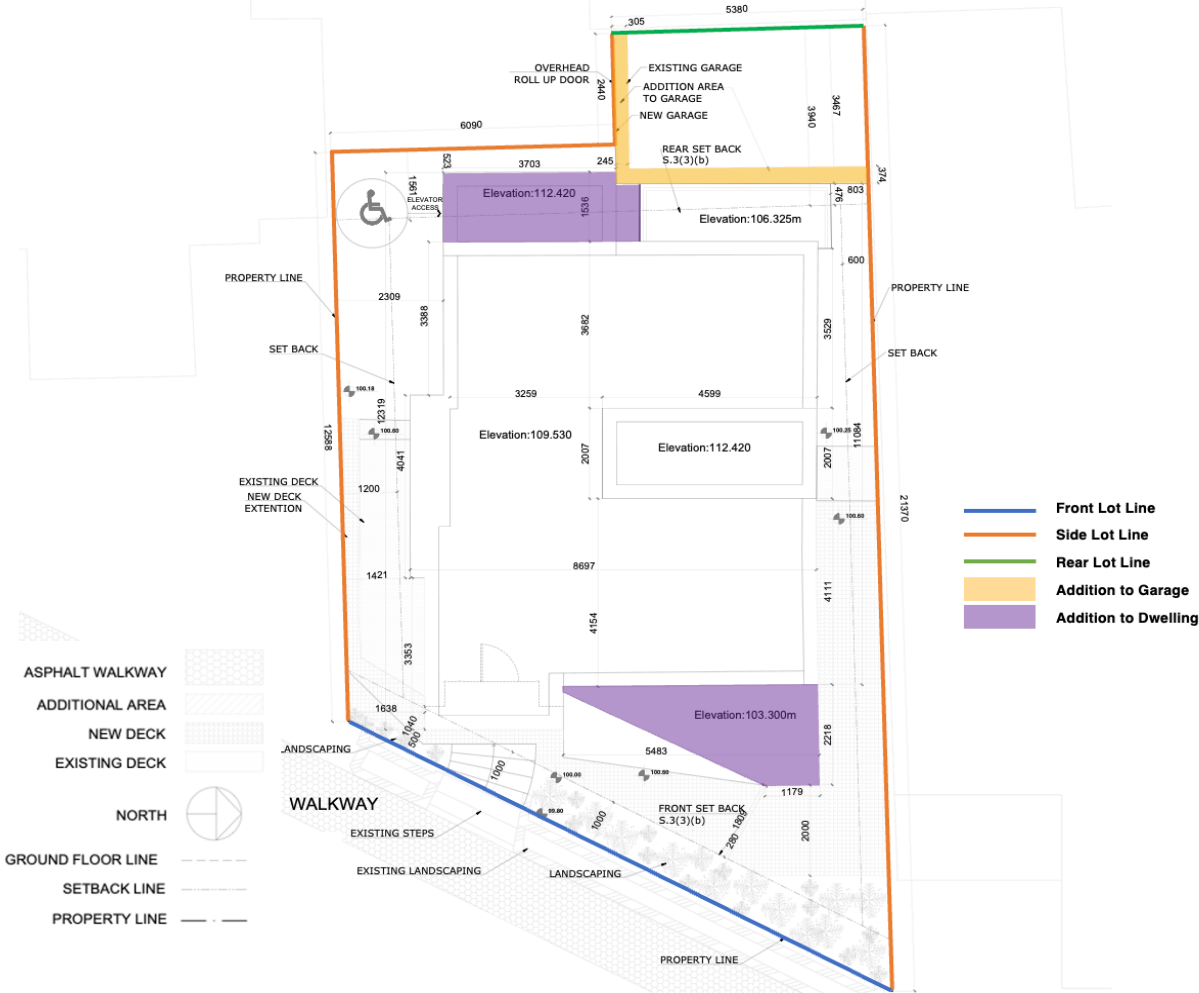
Site plan extract prepared by FNDA Architecture with added mark-up by JD Planning
